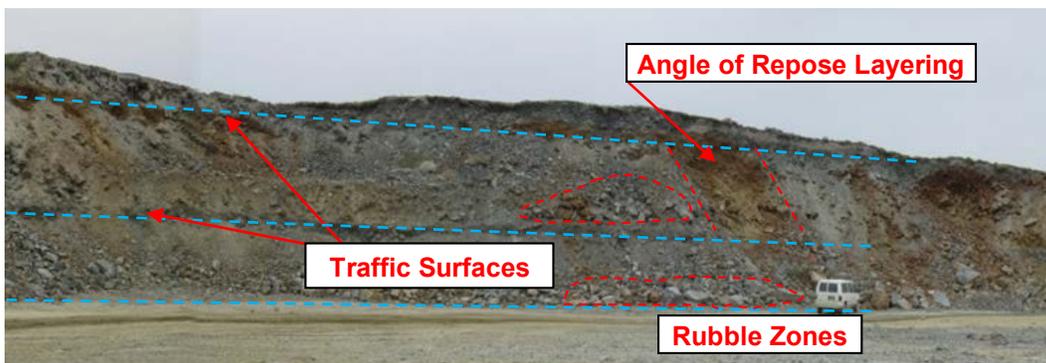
Excavated face of WRS 1 showing evidence of layered structure, traffic surfaces and rubble zones
